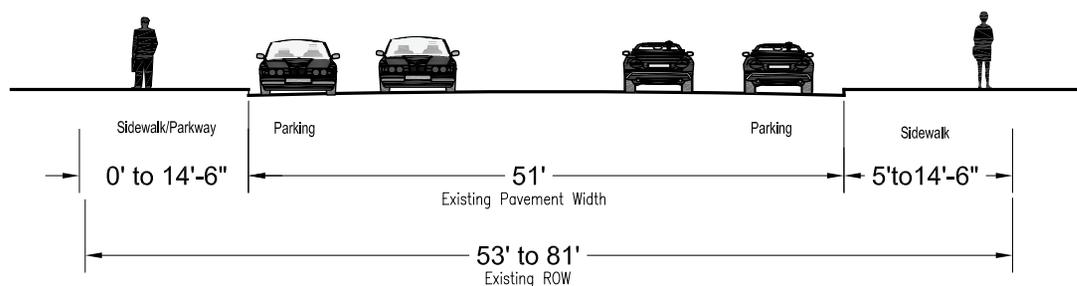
TYPICAL SECTION - 3RD AVENUE
